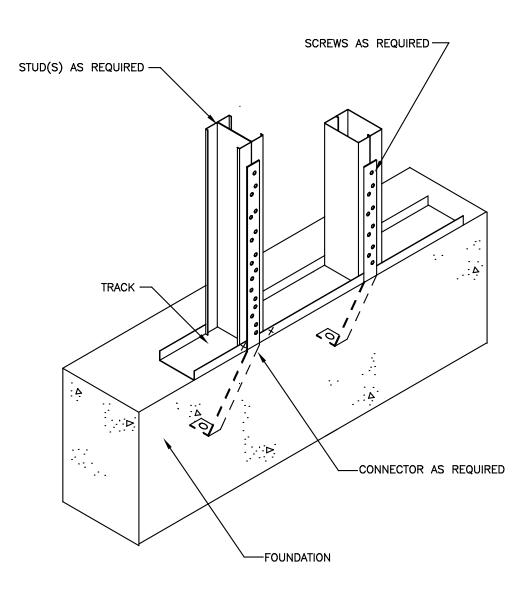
Wall to Foundation/Slab on Grade Connection 3
